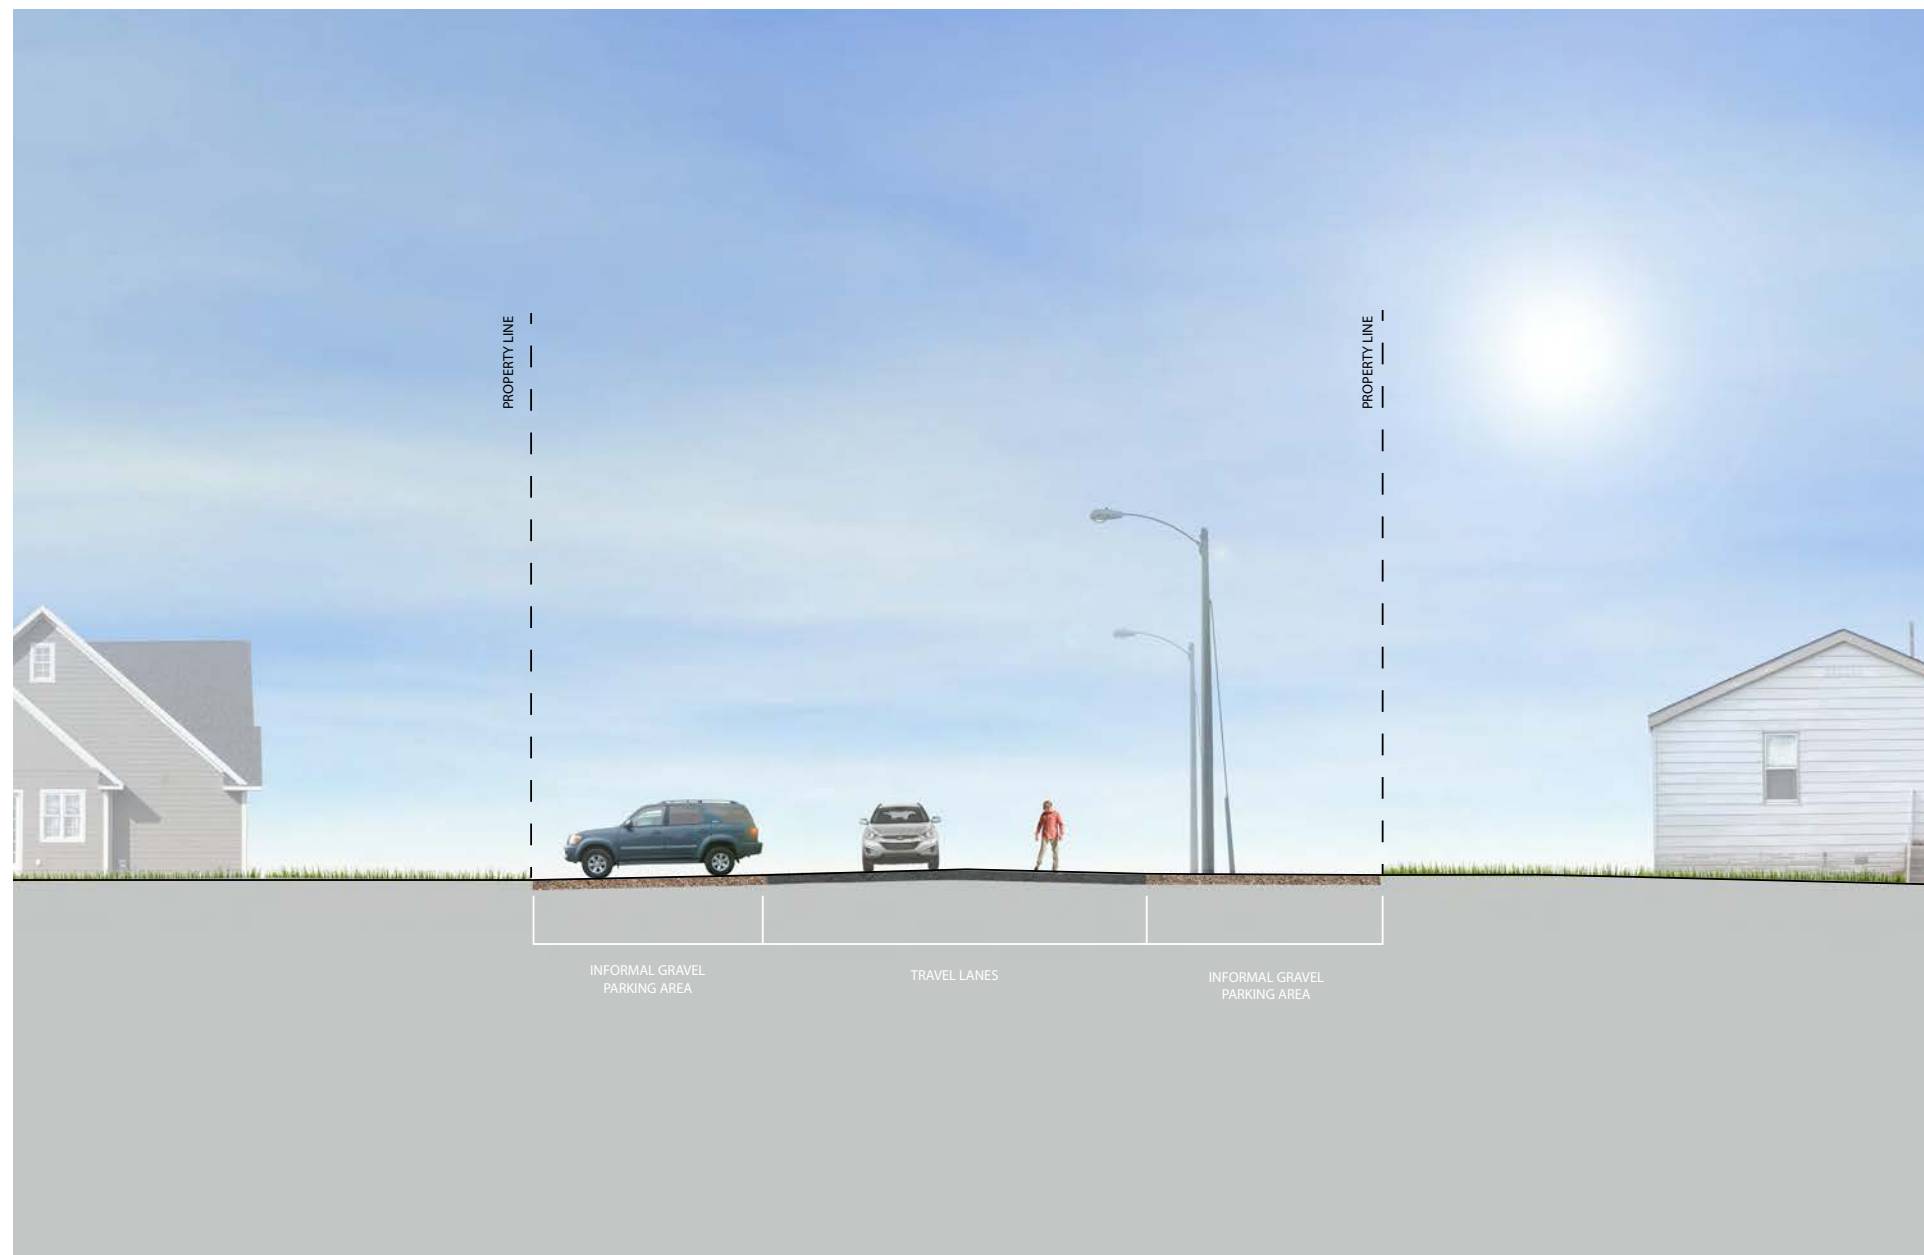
Existing conditions on typical study area street (100 block of Brent Street)
